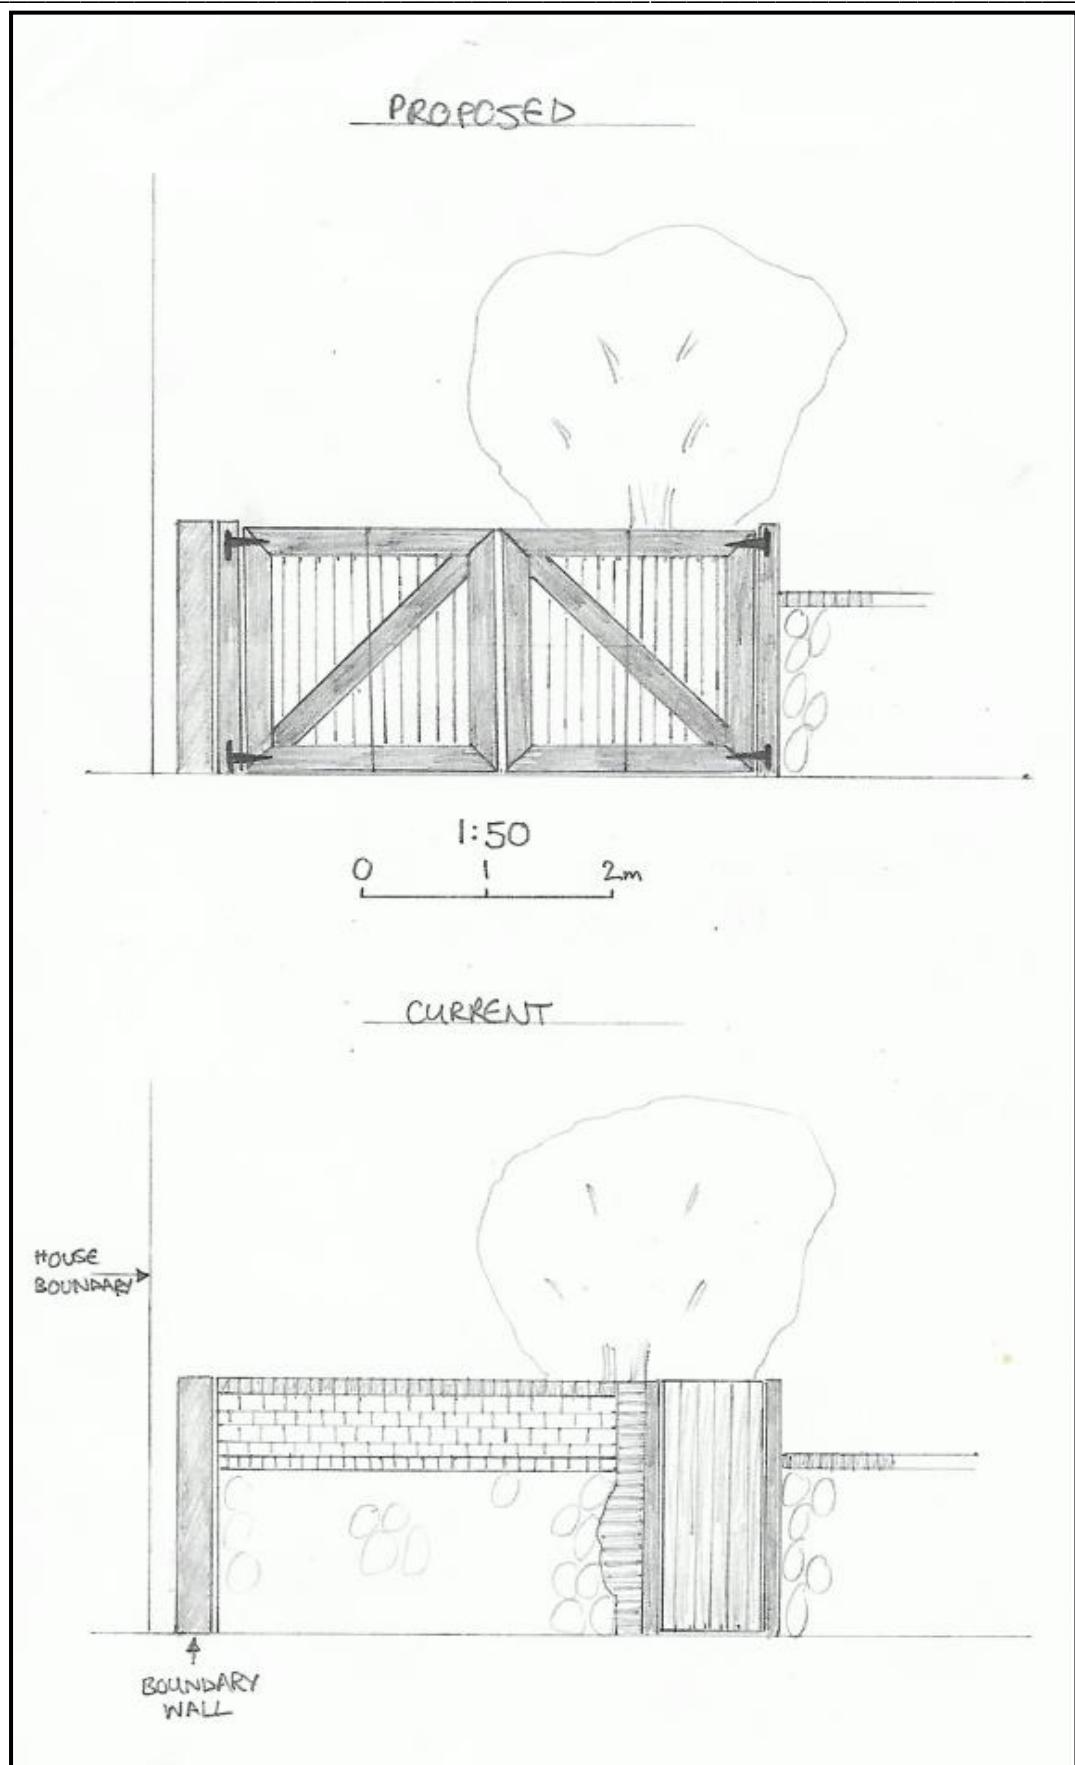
Existing and proposed elevation fronting Barrow Hill Cottages
